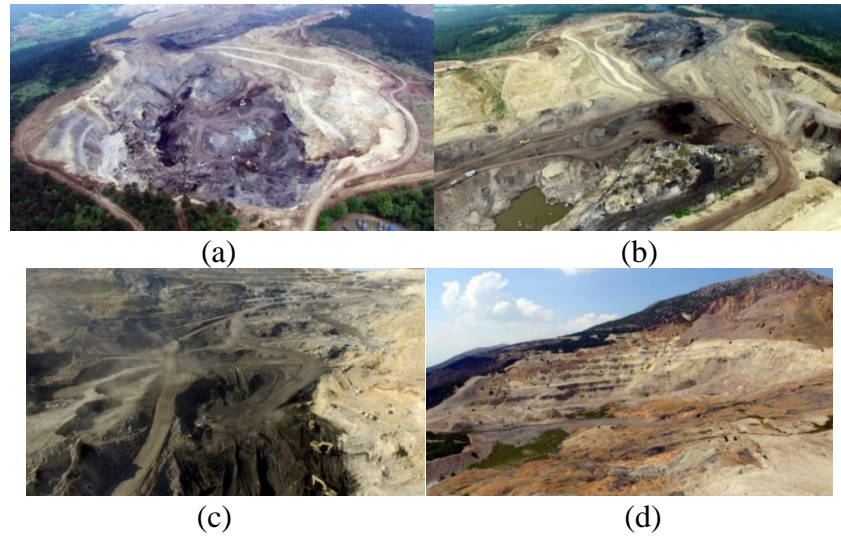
(a) Deniz Dedetaşı C Panel Open Pit Mining Area 1, (b) Deniz Dedetaşı C Panel Open Pit Mining Area 2, (c) Deniz Dedetaşı C Panel Open Pit Mining Area 3, (d) Soma Elmalı Mining Area
